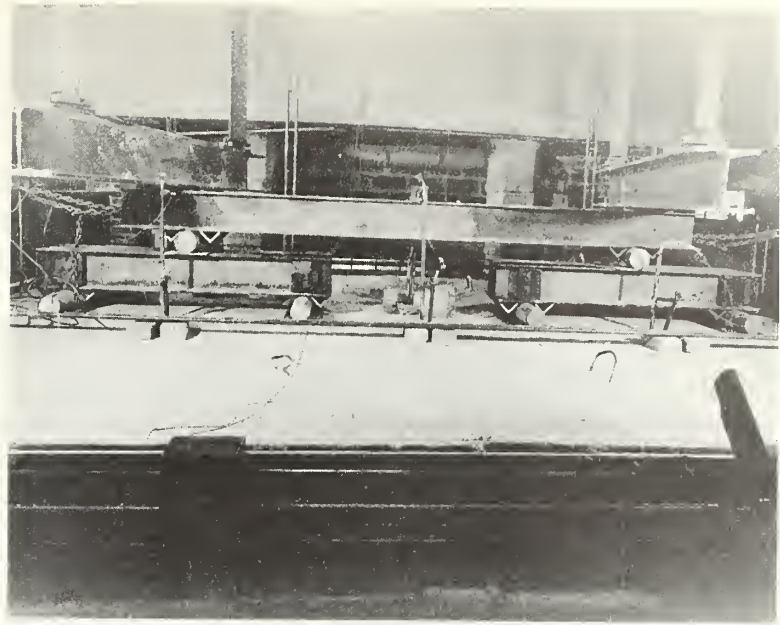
LOADING APPARATUS IN PLACE BEFORE TEST
